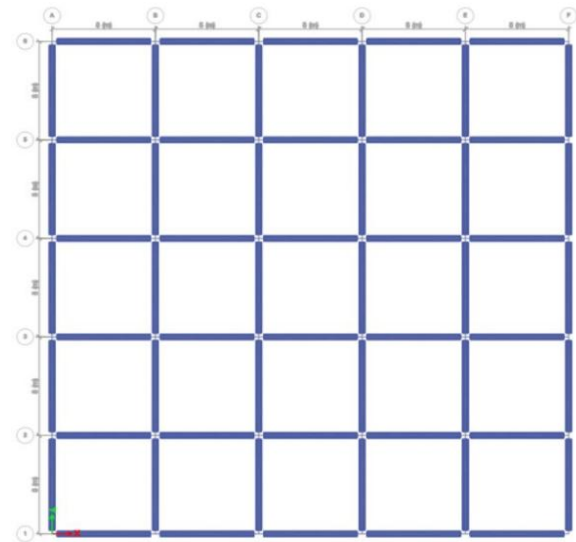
Typical Floor Plan of G+15 RC Frame Building (ETABS)
